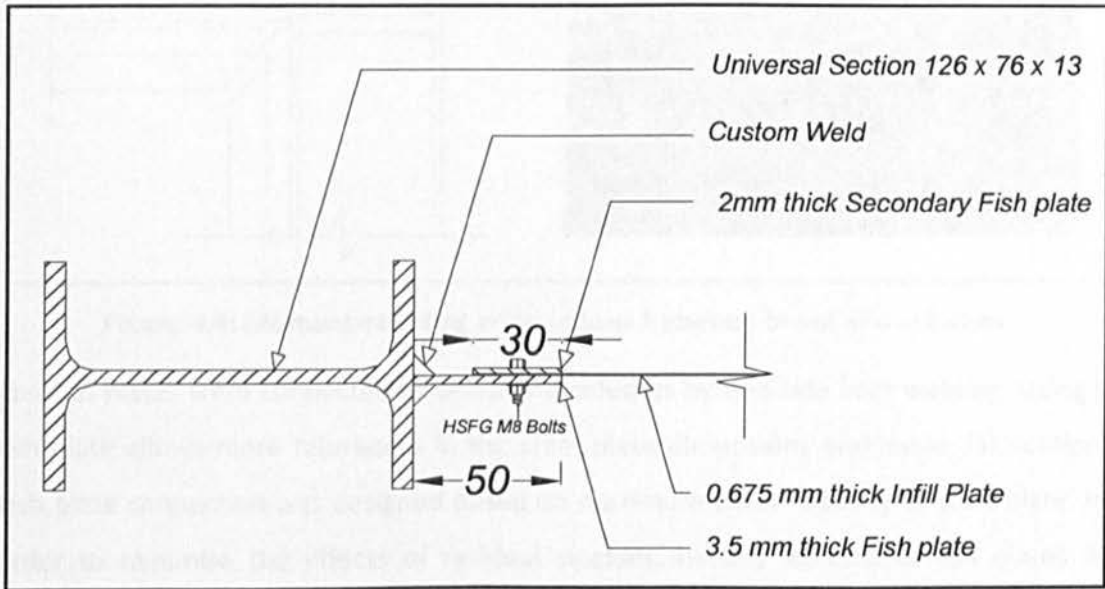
Detailed view for dimensions and type of connection between steel plate and boundary elements
